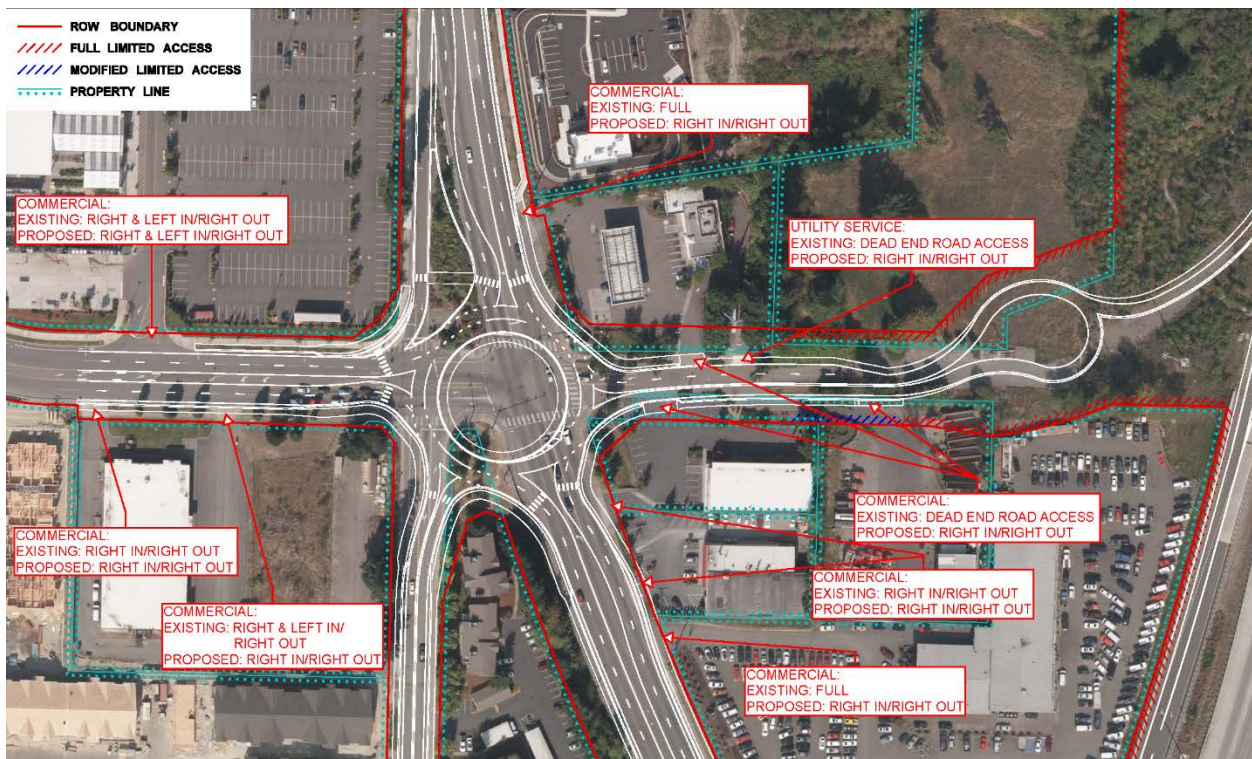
Existing Driveways near the SR 161/S 356th Street/16th Avenue S Intersection
